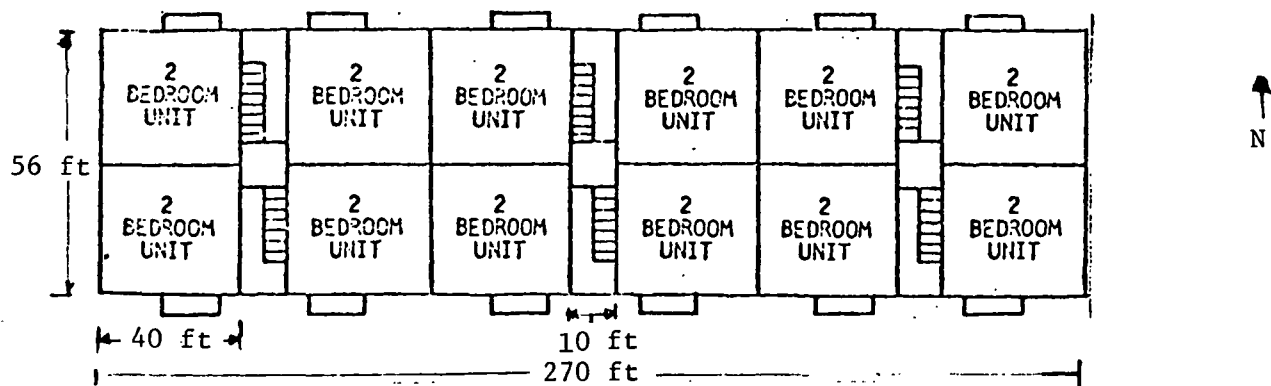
FLOOR PLAN FOR 2-STORY LOW-RISE
